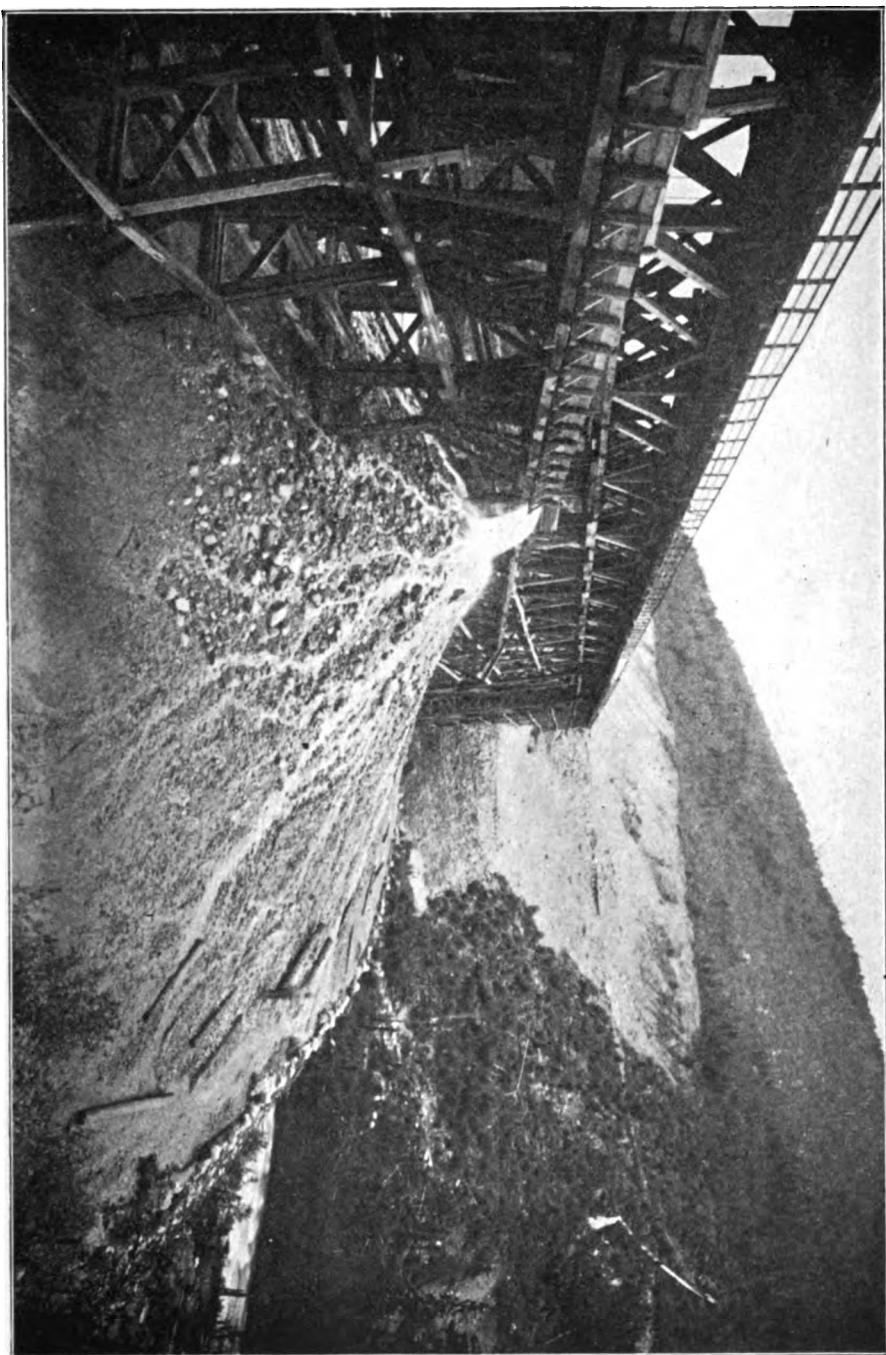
HYDRAULIC FILLING OF HIGH TRESTLE AT MOUNTAIN CREEK, B. C., ON CANADIAN PACIFIC RAILWAY, NEAR VIEW OF
